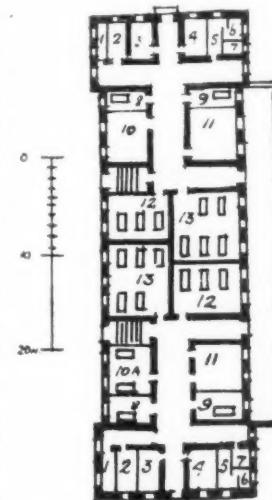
GROUND FLOOR PLAN OF PAVILION FOR INFECTIOUS DISEASES, THE VIRCHOW HOSPITAL, BERLIN.
